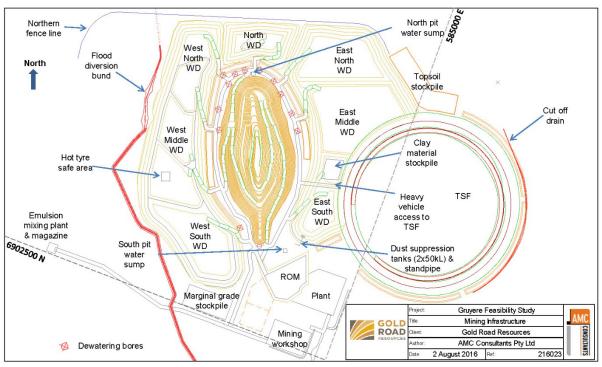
Layout Plan of the Gruyere Pit and Surrounding Infrastructure
